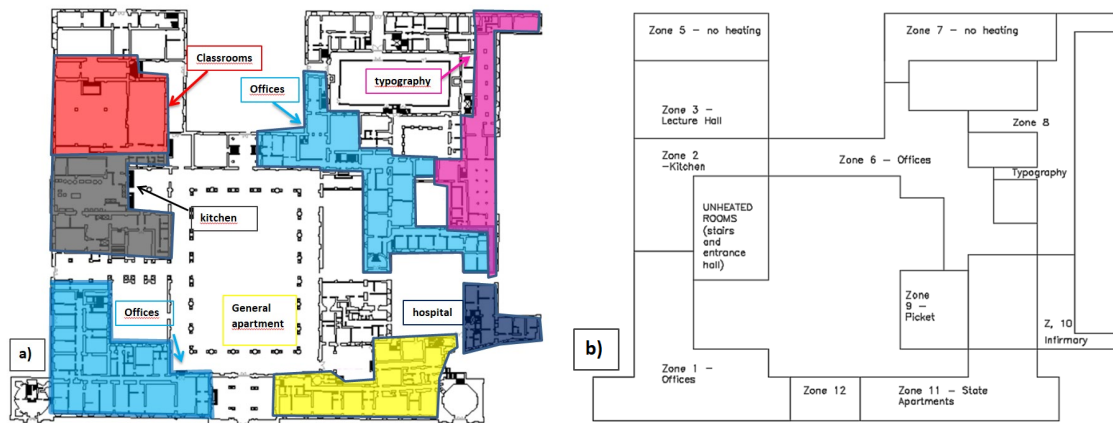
a) Ground floor plan and intended uses. b) Thermal zones of the ground floor in the simulation model
